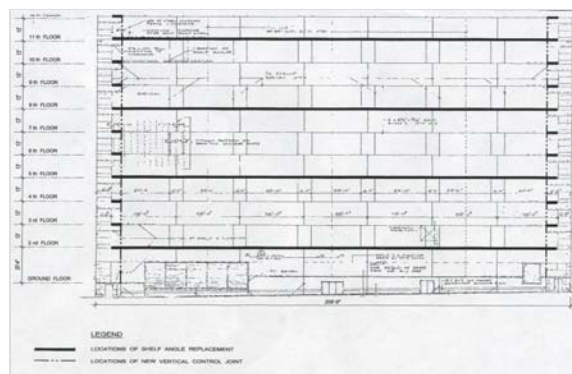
East Elevation – Heavy Lines Indicate New Shelf Angles to be Installed On Every 3rd Floor (in lieu of every floor as originally installed)
